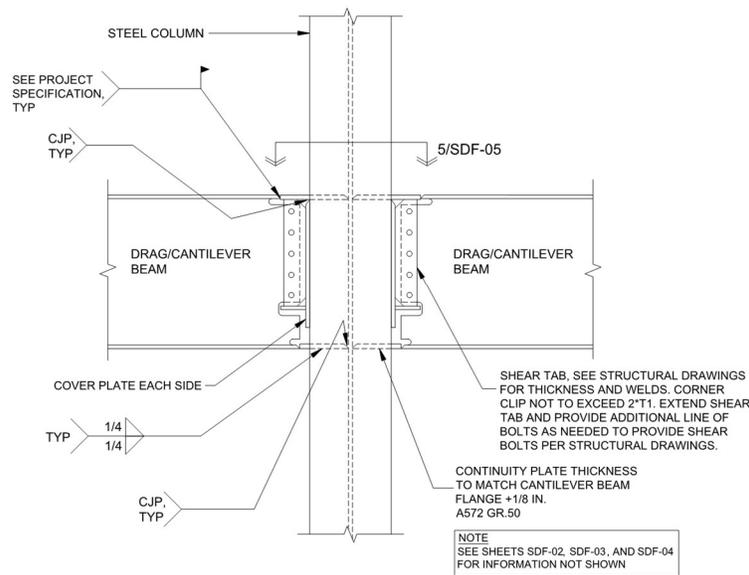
Orthogonal gravity cantilever when cantilever depth is greater than DFF beam depth.
